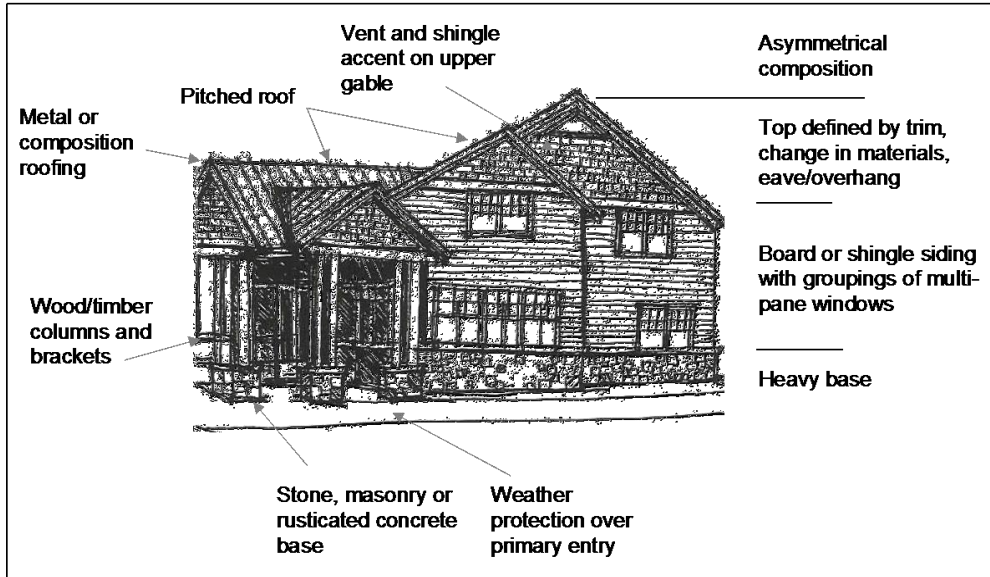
G: Typical Building Elements in Sandy Style (Commercial Building)
